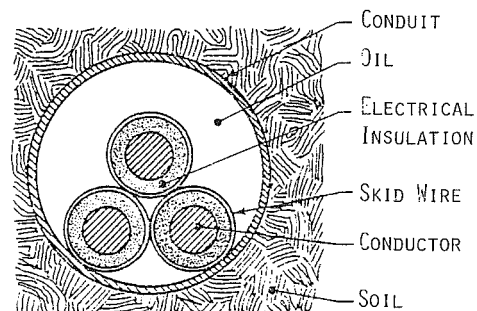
Cross section of a typical underground, high-pressure, oil-filled cable system
